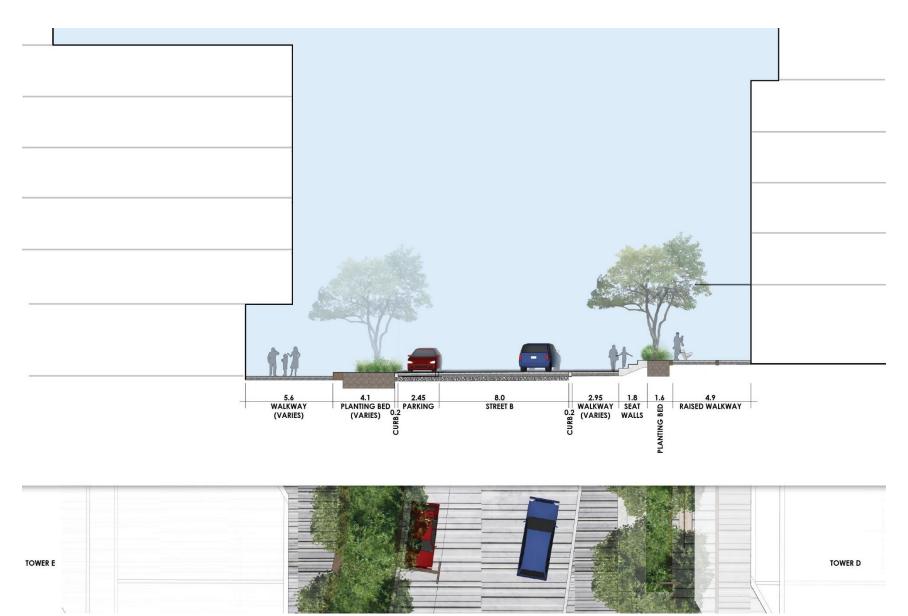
Cross Section of Street B - the Promenade (Land Art, February 2023)
